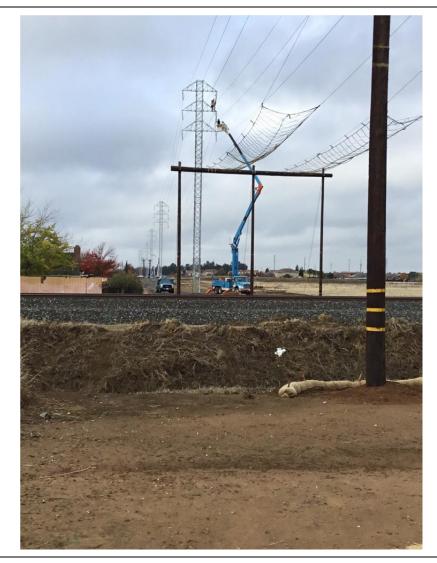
Crews removing transmission line stringing rollers at structure 0/6.
